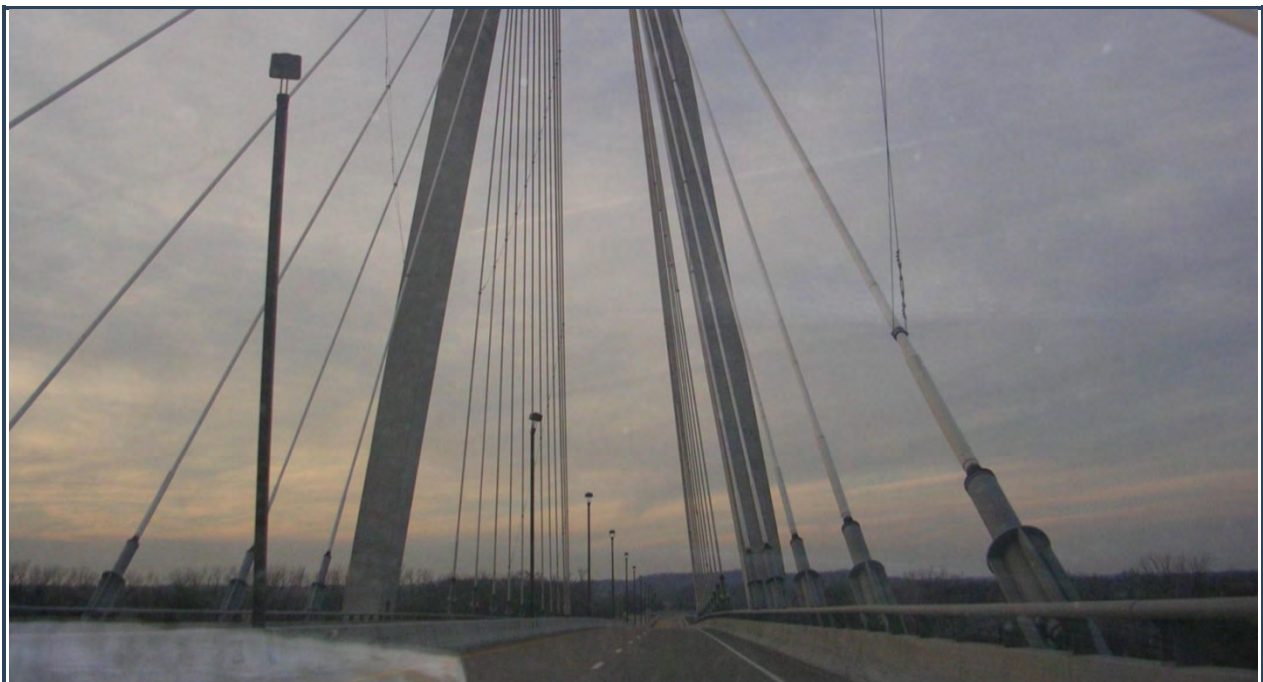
Cable-Stayed Bridge Example: The cables of the cable-stayed bridge allow for a largely uninterrupted view of surrounding landscape elements (William H. Natcher Bridge) (Photo Credit: James McCray)
